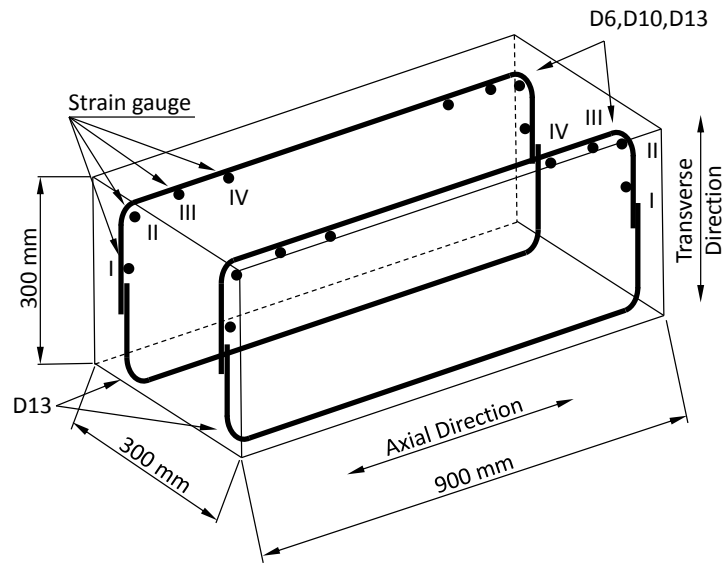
Details of Laboratory Specimen (Adapted from Kubo et al. 2003)
